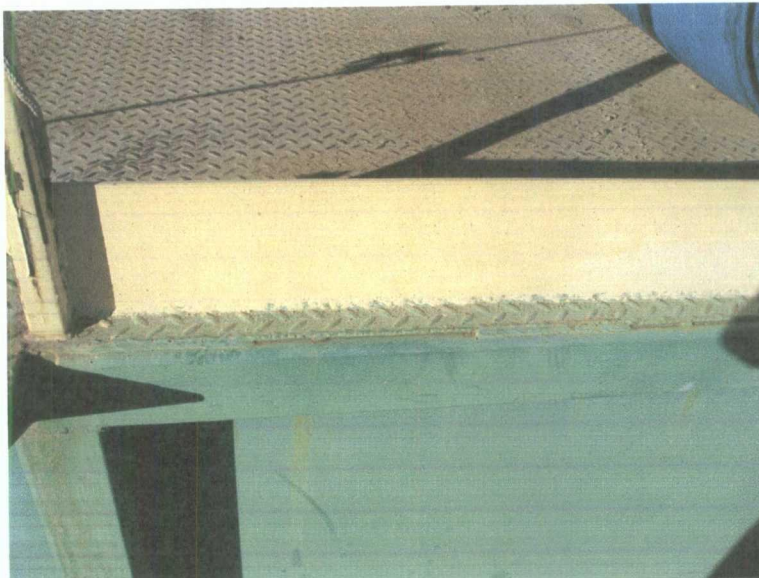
Continuous Welded Curb for Empty Drum Containment
